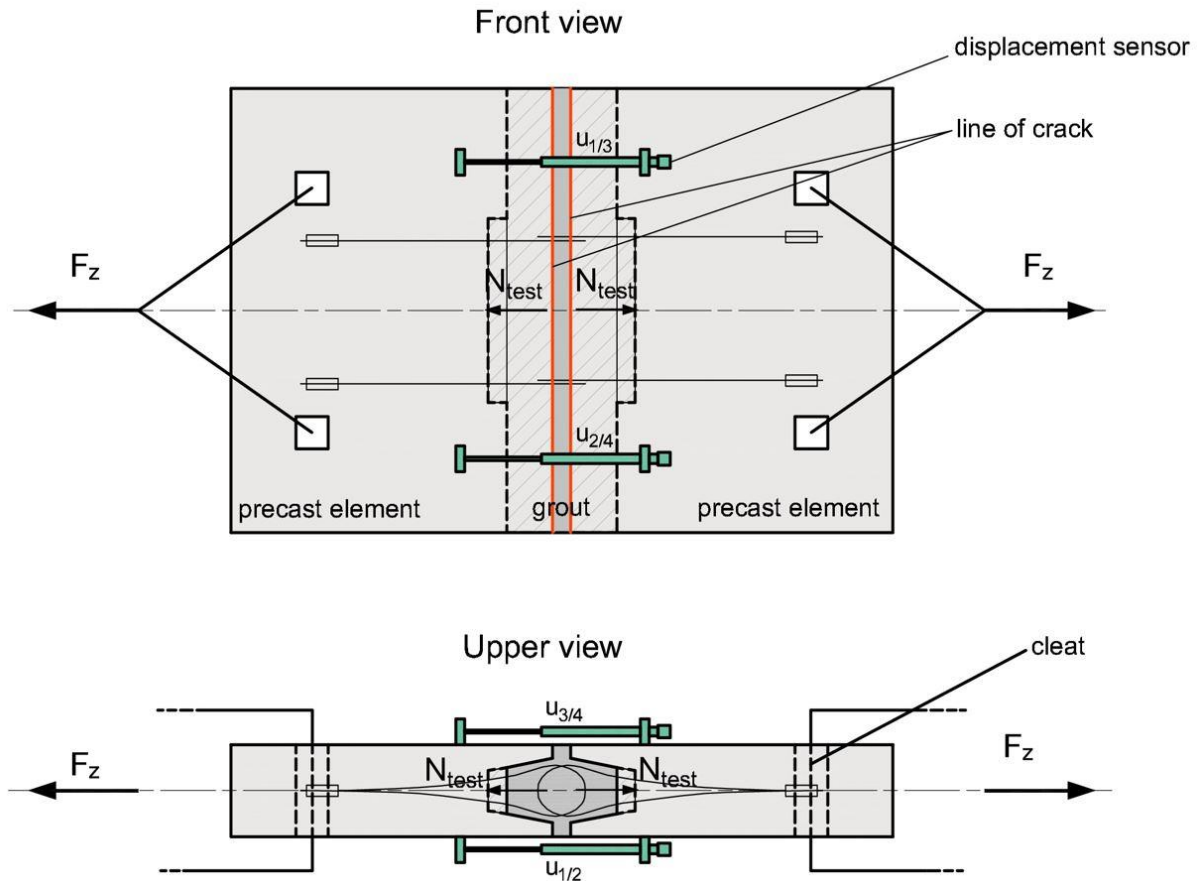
Test setup for connections of two precast concrete elements
